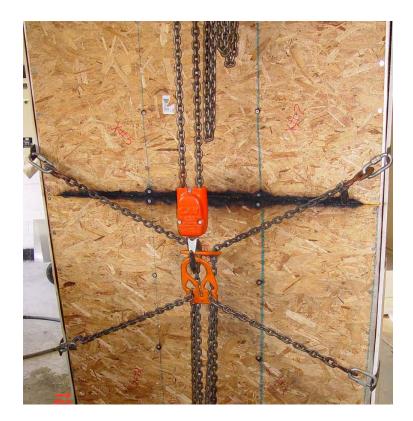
Damage to unexposed side of floor assembly (Test OSB-03A).
